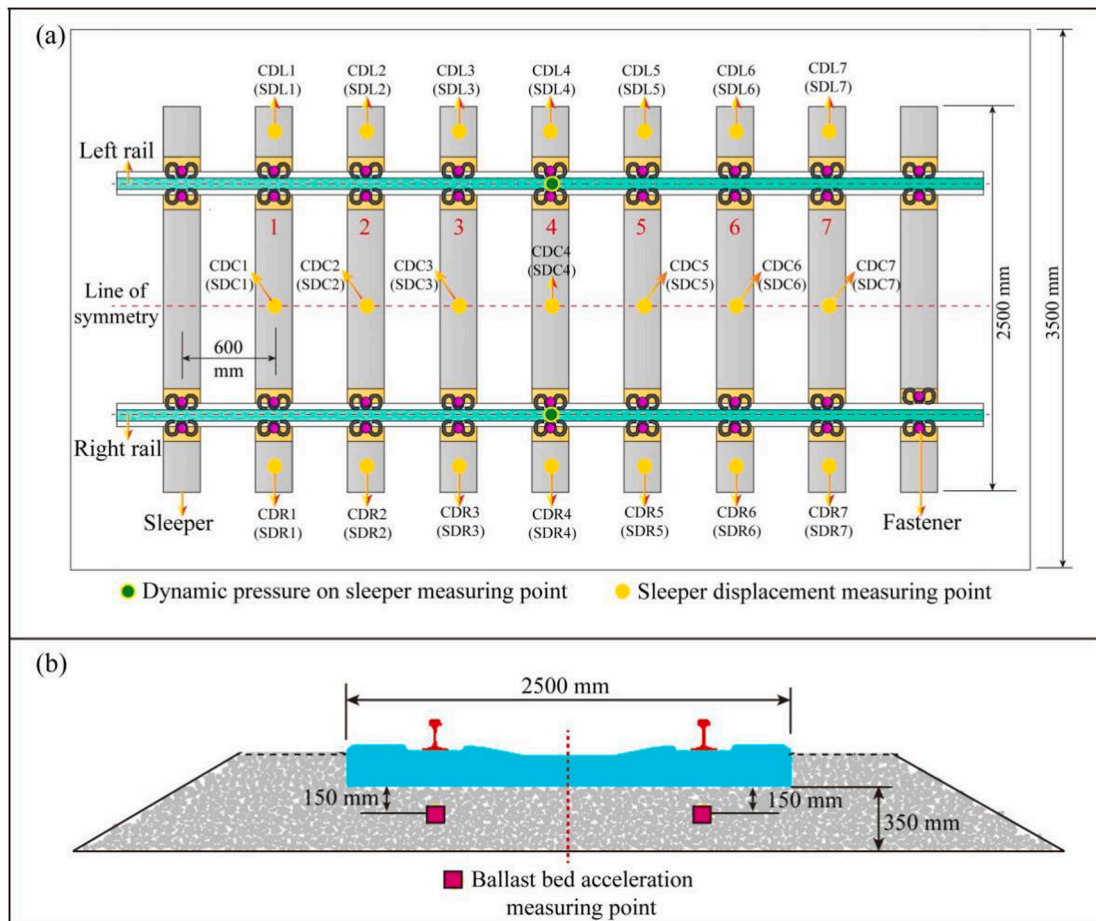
Layout of measuring points: (a) Plan view, (b) Side view.
